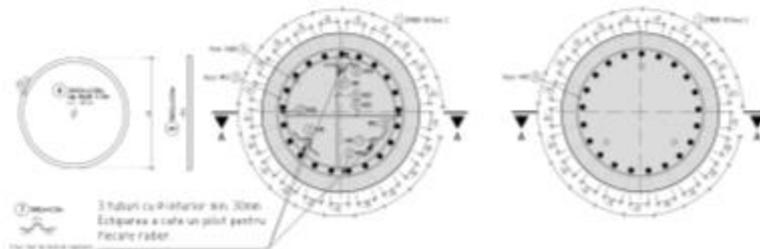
Pile sections – reinforcement and tubes for the sonic test
